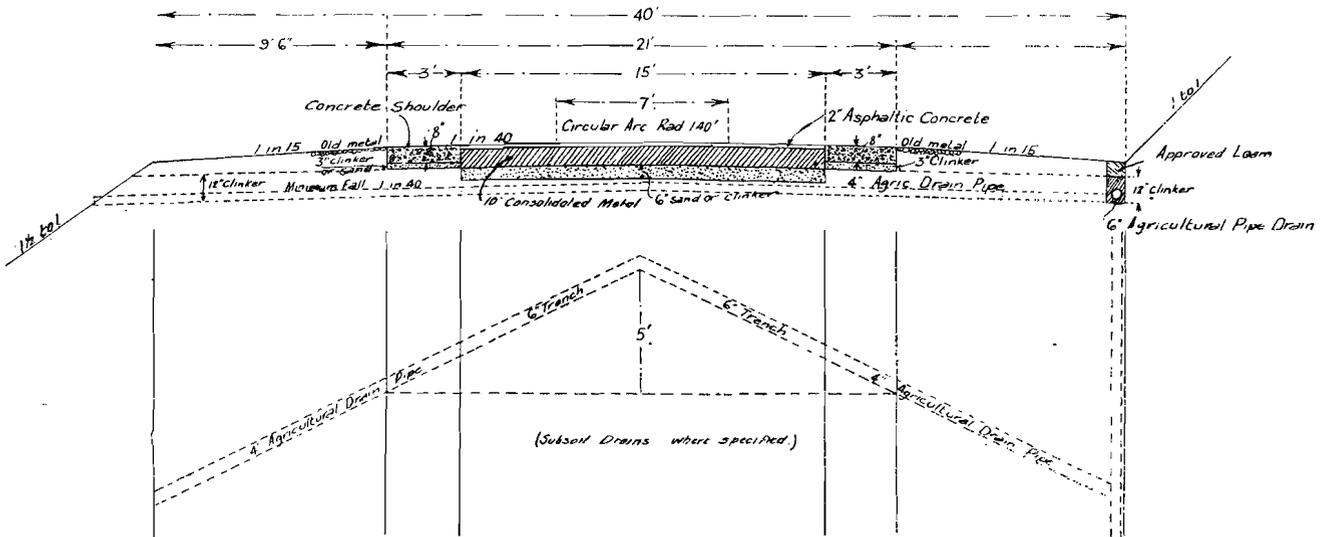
Cross Section of Geelong Road as Reconstructed
